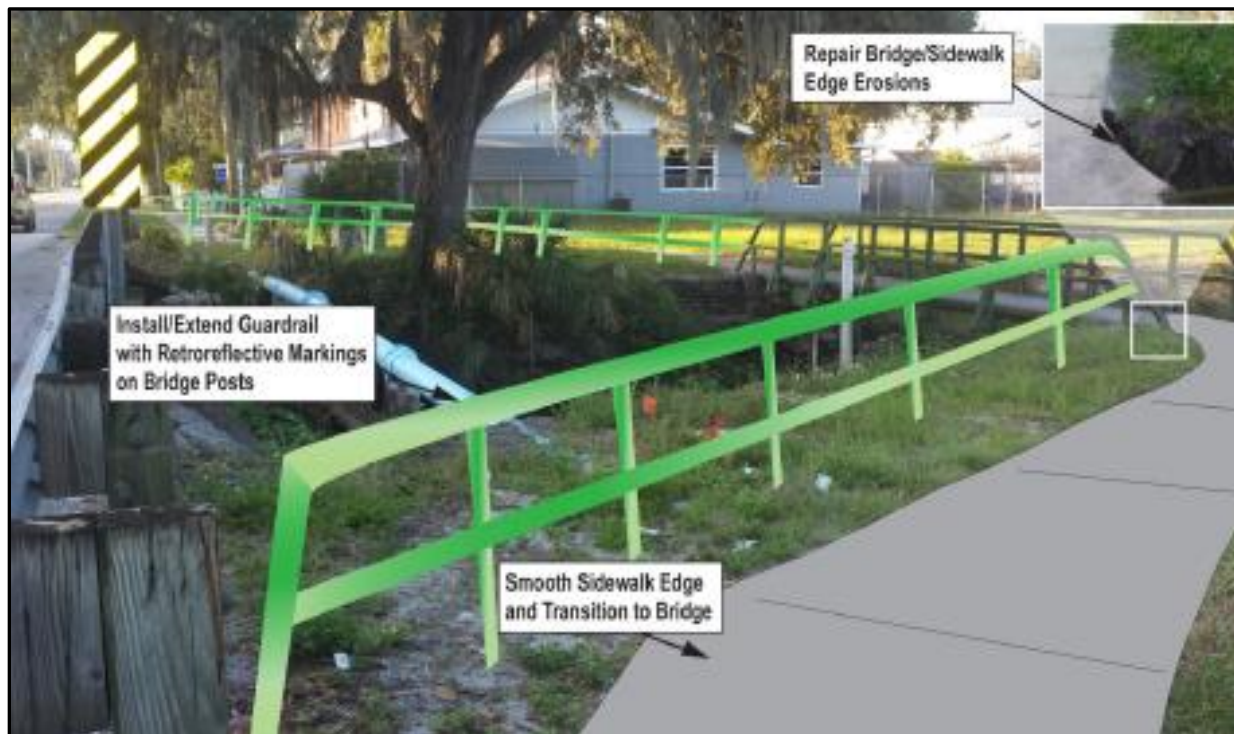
Example of Proposed Pedestrian Bridge Improvements
